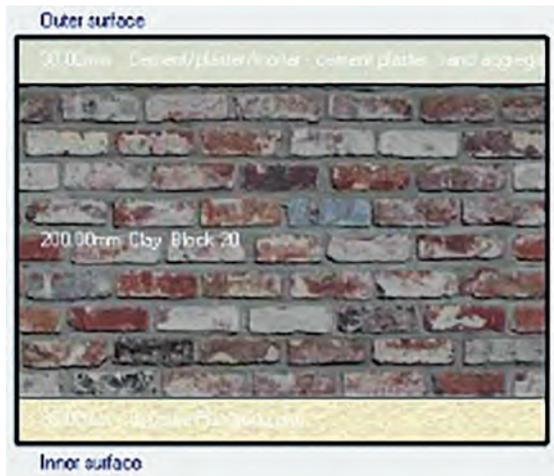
Wall Type 46 Layout, DesignBuilder.
